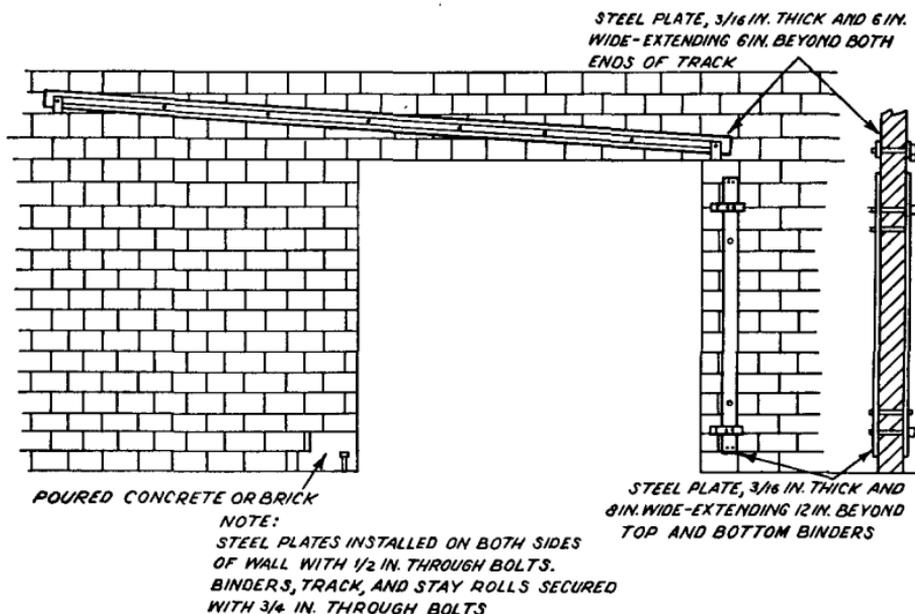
Concrete block wall prepared for a tin-clad or sheet metal single slide door.
